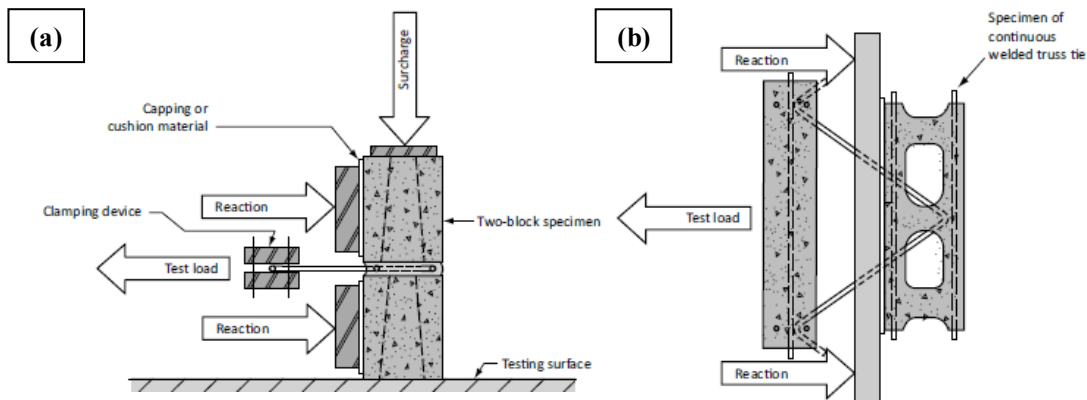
Tension test on ties: (a) elevation view, and (b) plan view. (CSA, 2014).
